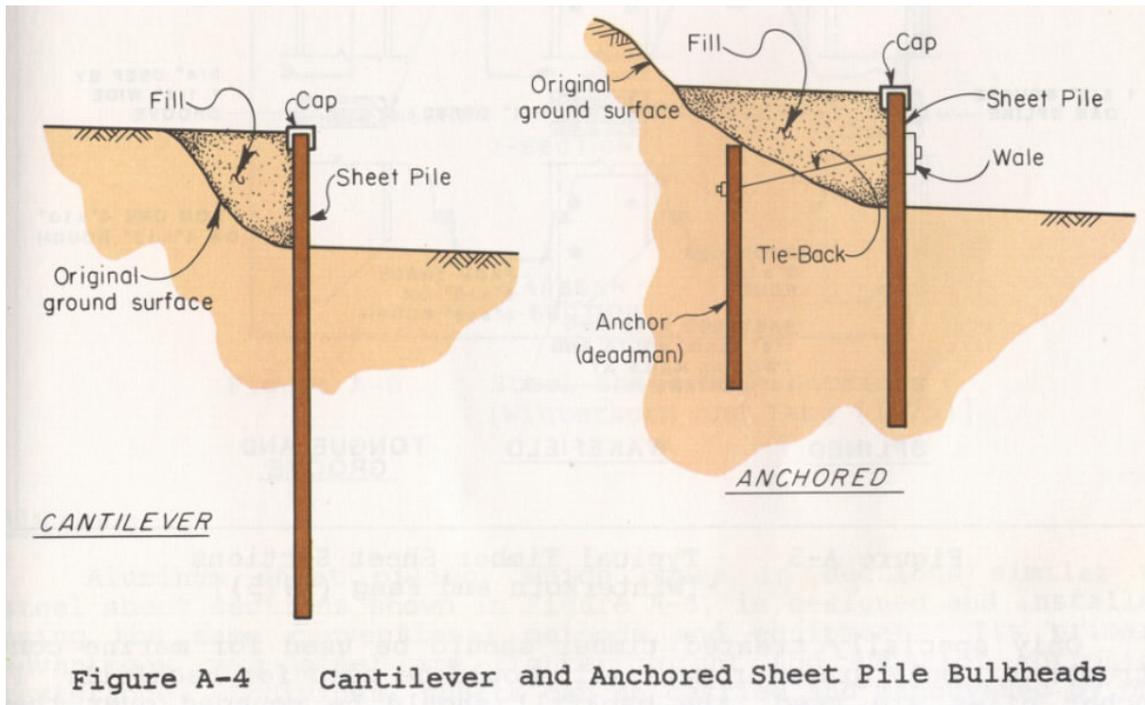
Cantilever and Anchored Sheet Pile Bulkheads
